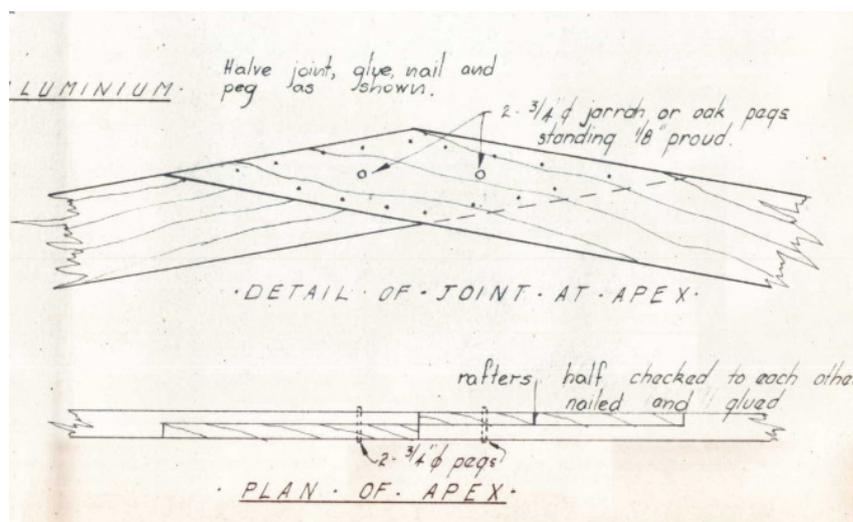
Detail of rafter apex at Bruce Terrace Cottages Housing Complex.
